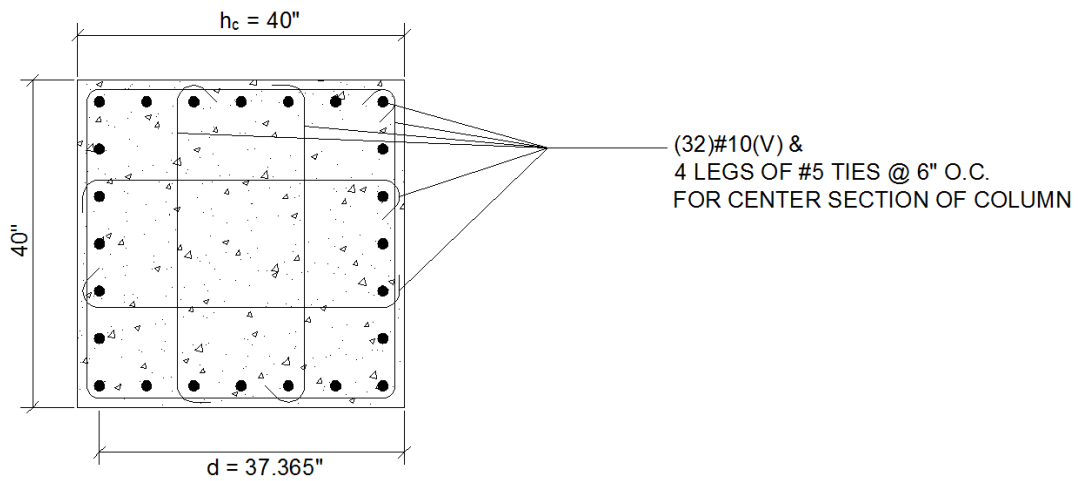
Exterior column, cross-section at center section of column at the 2nd floor level based on tsunami design requirements.
